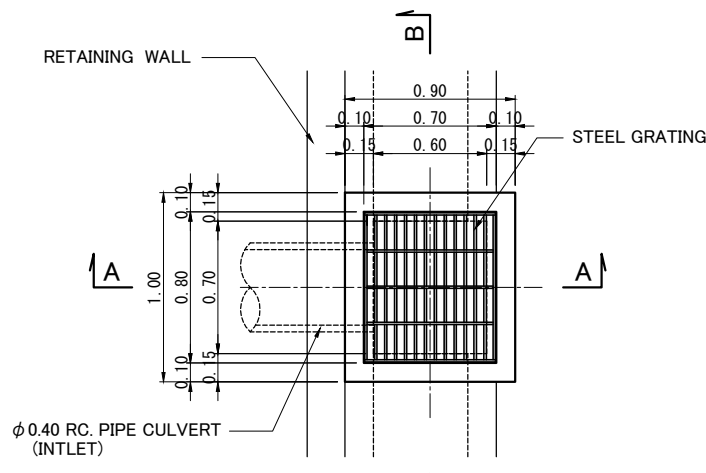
DETAILS OF INLET CATCH BASIN AT MEDIAN AND PIPE CULVERT
